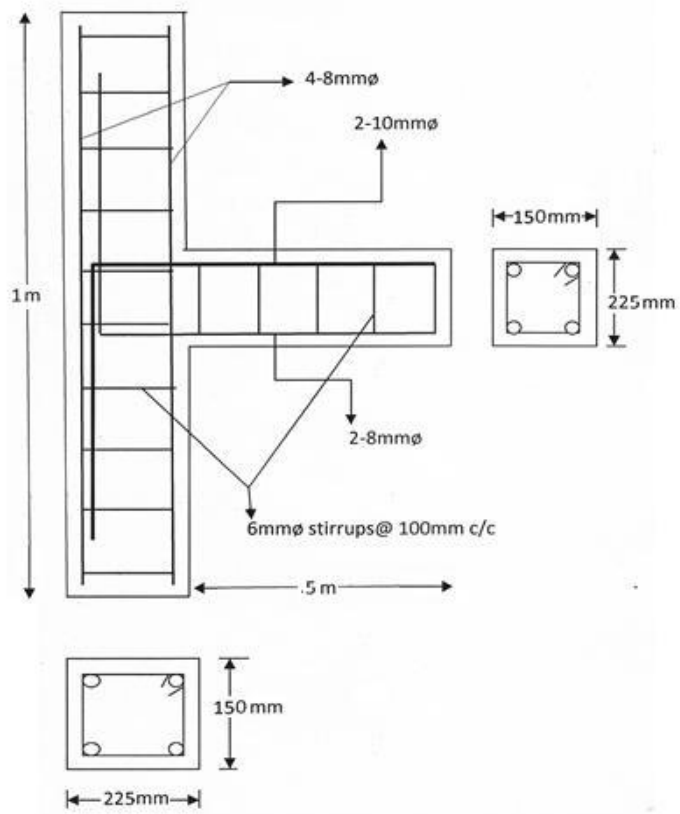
Reinforcement Detailing and Dimension of the Exterior Beam-Column Joints, B1
